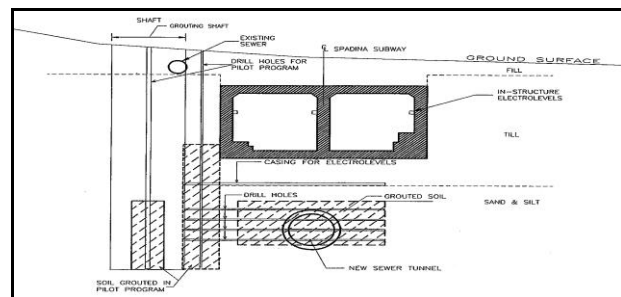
Scheme of compensation grouting for tunneling beneath the existing Spadina Subway (after S.J. Boone and et al 1996)
